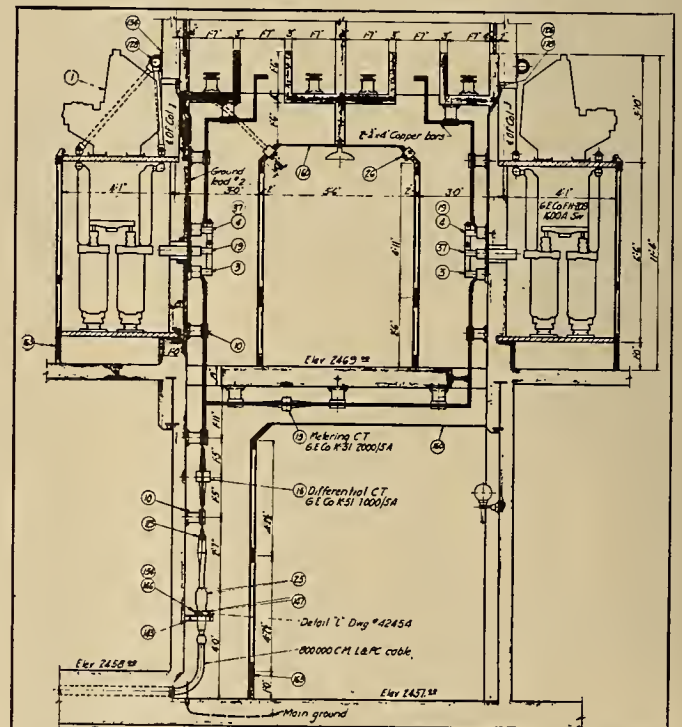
Transverse section through typical transformer cell showing (below) main floor and (above) 11-kv. bus floor.
